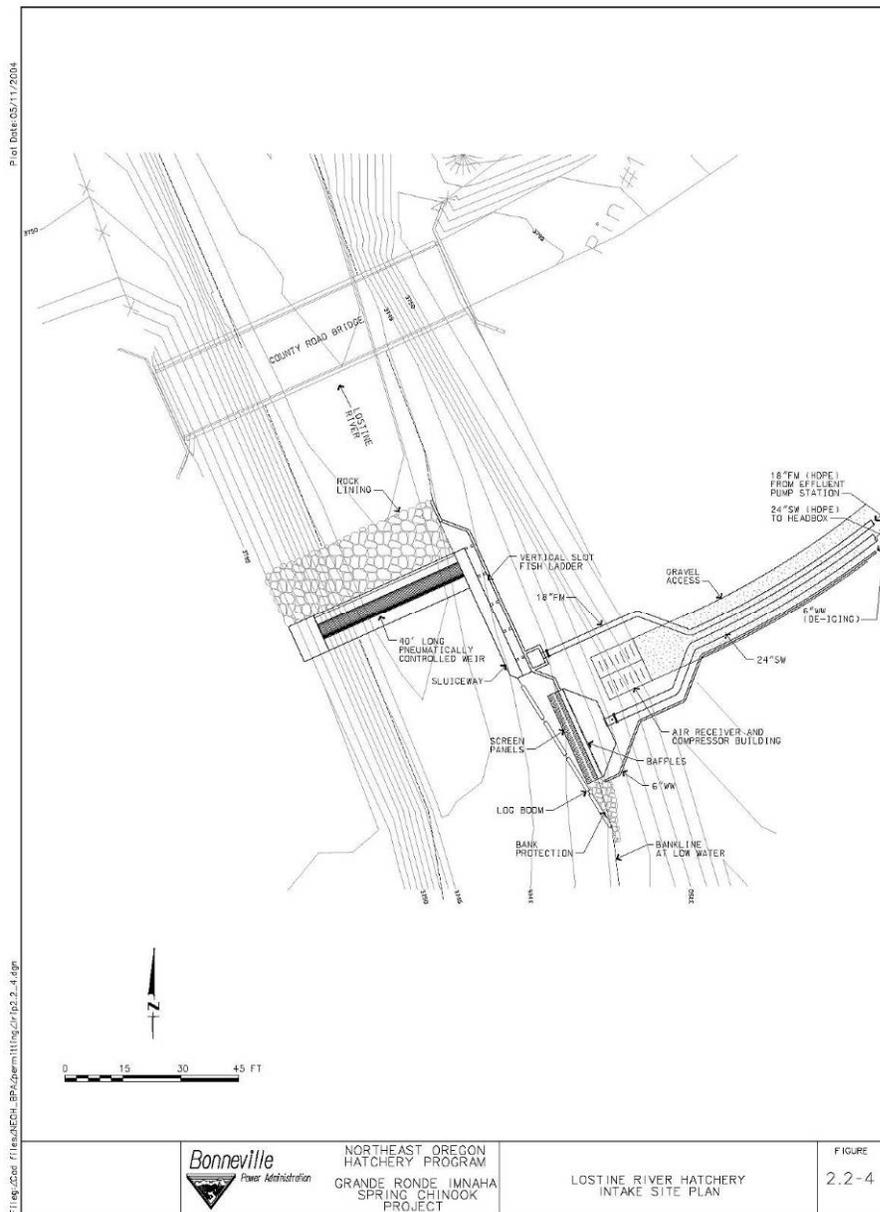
Lostine River Hatchery Intake Site Plan as Proposed in the BA.
